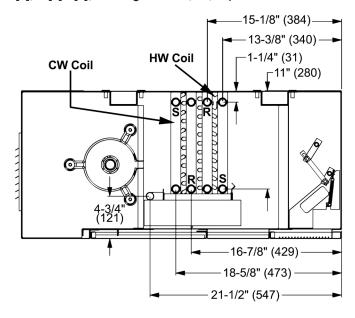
Chilled Water and Steam Unit (Cooling Coils V[5], S[6]; Heating Coils 68, 69)
